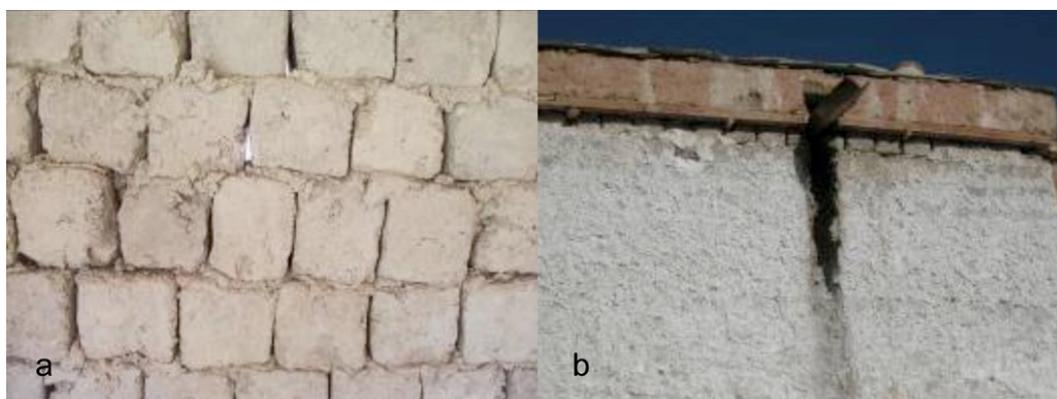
Kanji, Ladakh: (a) the lack of earthen mortar between the *pakbu* laid horizontally with incorrect *pakbu* vertical-joint design and; (b) a roof-drainage system, which does not work correctly, damaging the wall surface (credits: Désirée De Antoni, 2010 (a) and 2009 (b))
